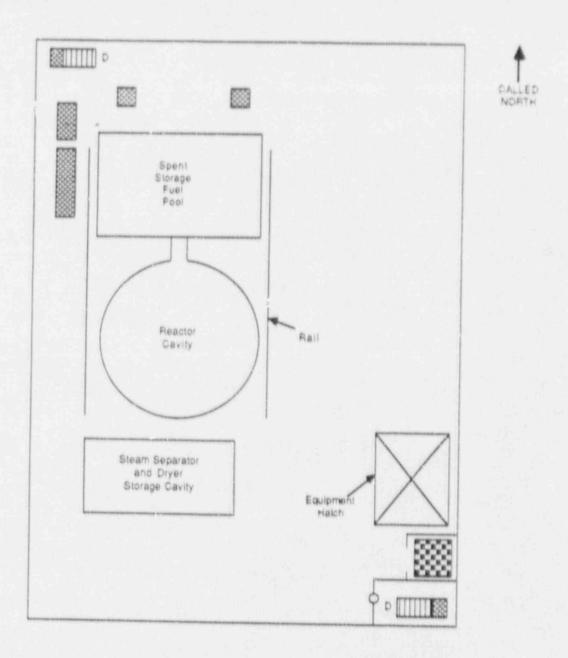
Oyster Creek Reactor Building - Elevation 119'-3"
